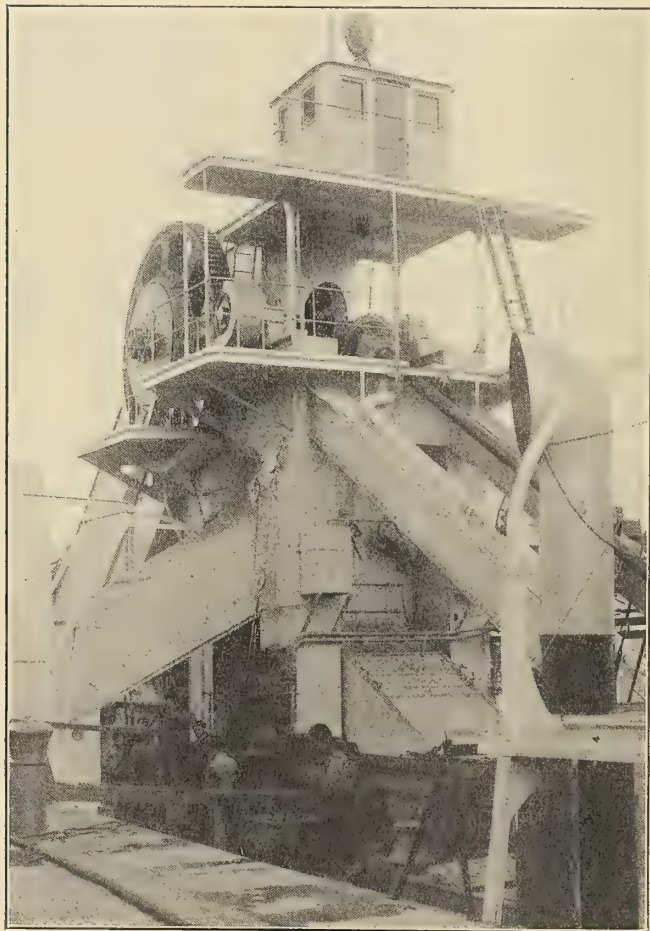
VIEW SHOWING FRICTION CLUTCH ON BUCKET DRIVE
